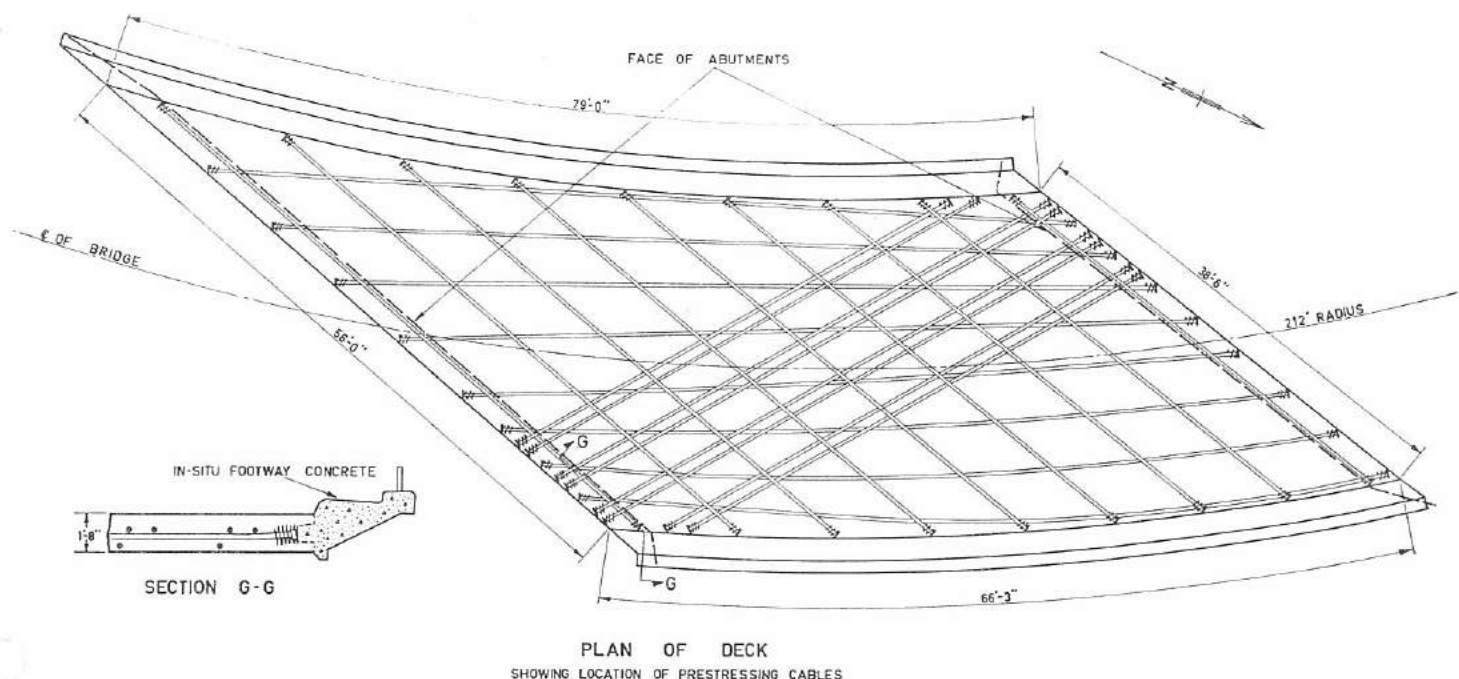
Skew Flyover—Plan Showing Slab Prestressing.
